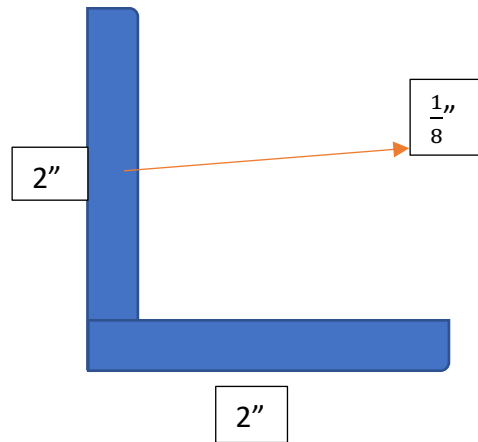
Dimensions of cross-sectional area of a member of the truss constructed of steel angle.
